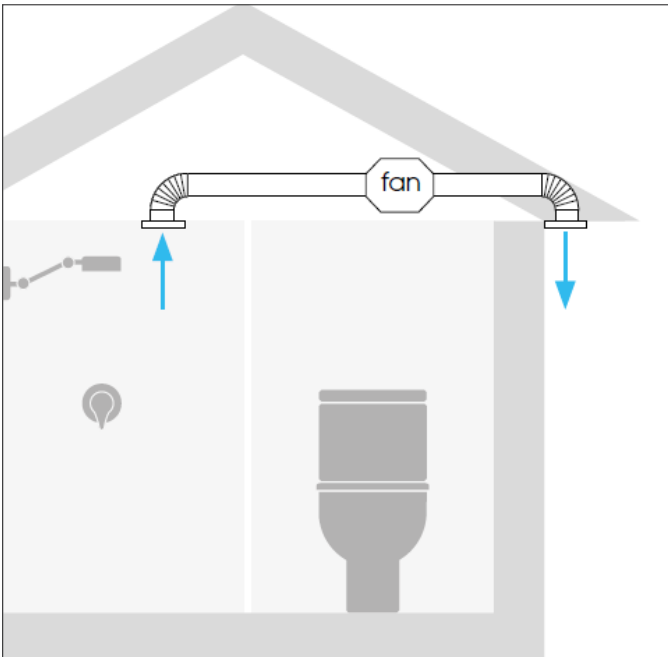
Intake grille not included and shown for schematic purposes. Skeleton kit allows choice of intake grille (sold separately)
